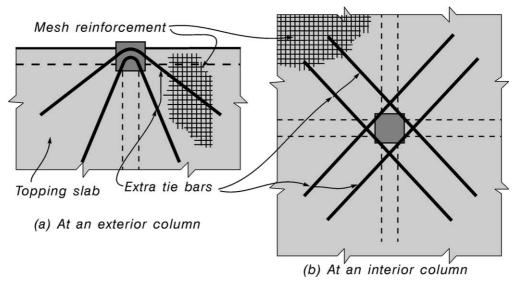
Strut and tie node detailing (after Standards New Zealand, 1995)
